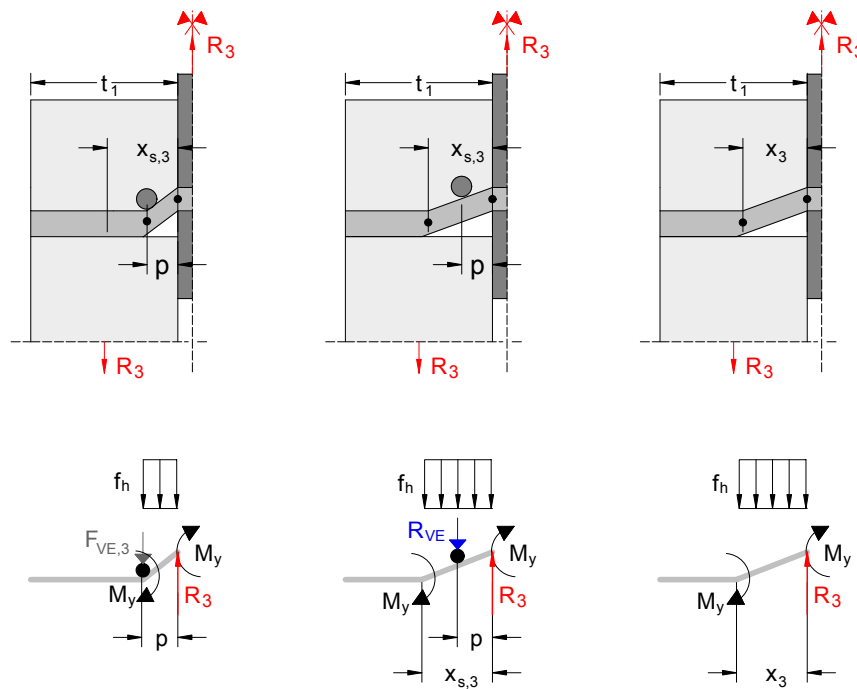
Reinforced connection with sub-failure mode “rigid”, reinforced connection with sub-failure mode “soft” and non-reinforced connection (from left to right side)
